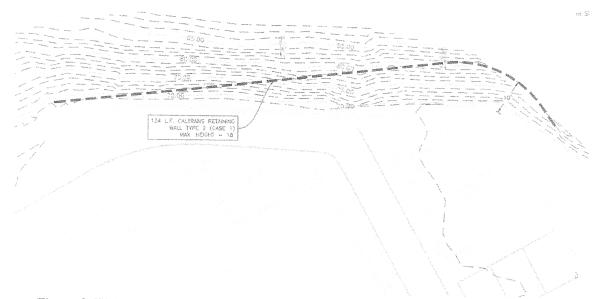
Wall alignment analyzed for CALTRANS typical tapered retaining wall design.
